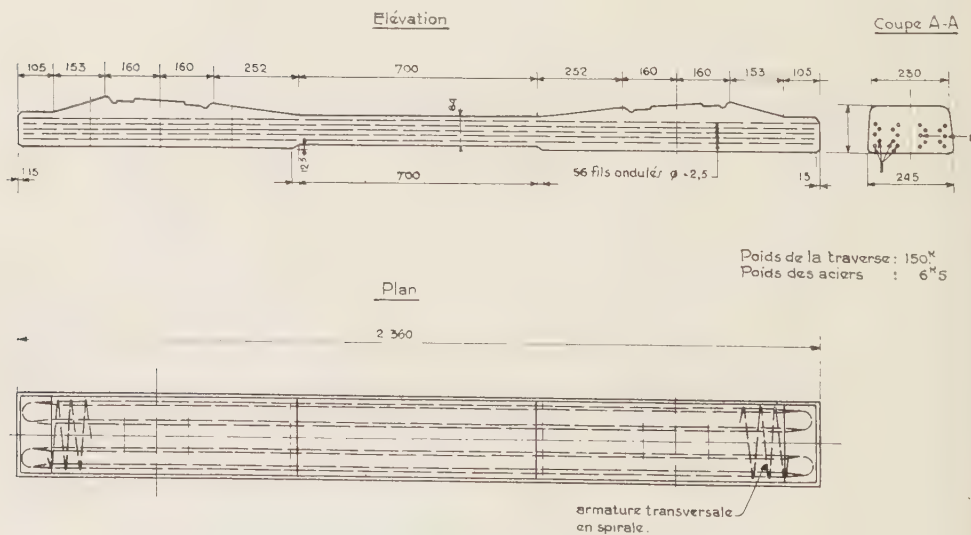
French National Railways*. Brignoud STUP sleeper of prestressed concrete.
